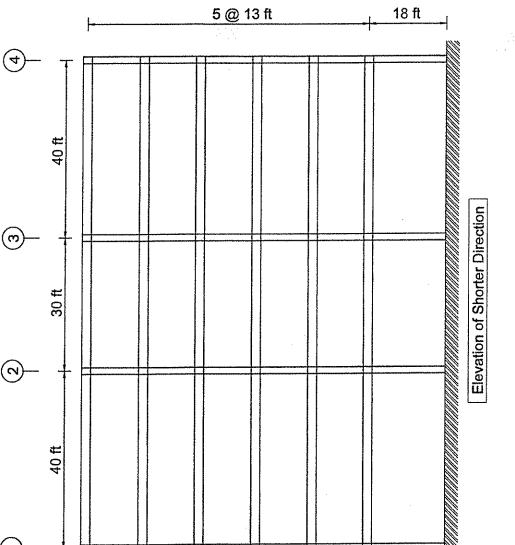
Elevation of the Demonstration Structure Using 2D-APC System
